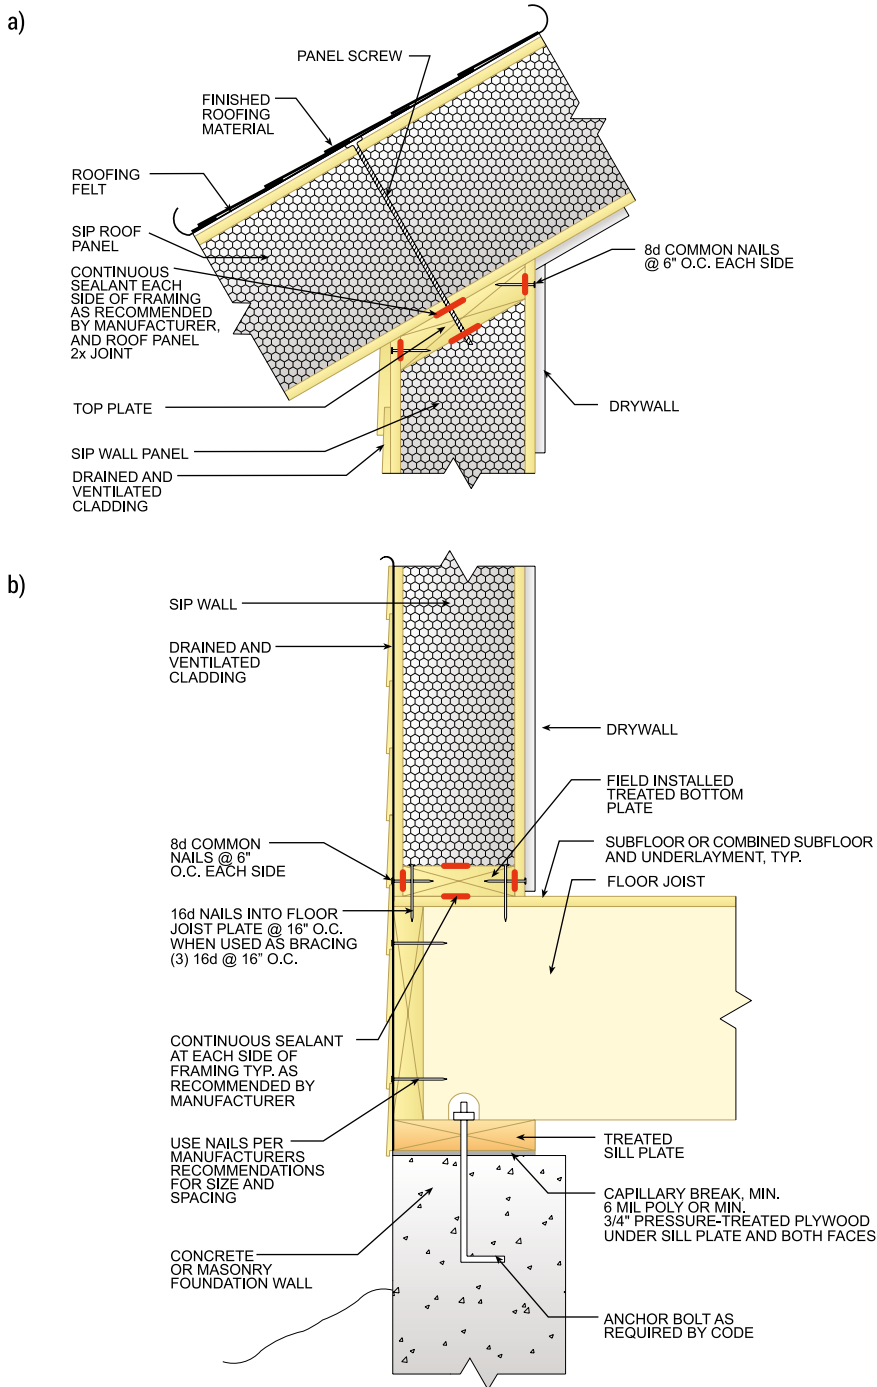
Structural insulated panels: a) roof-to-wall panel connections, b) foundation connections (Source: WEB-3)
